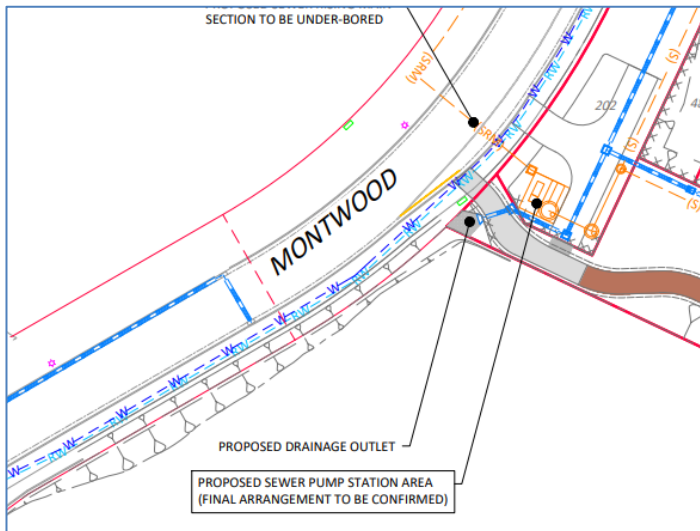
Exert from the submitted plan set showing stormwater discharge into to a non-existent drain.
